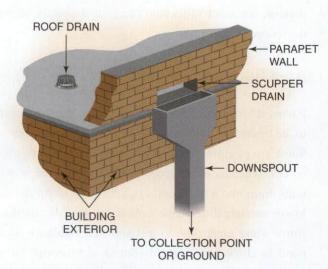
A scupper drain serves as the main drain of a roof or can be used as an overflow drain
